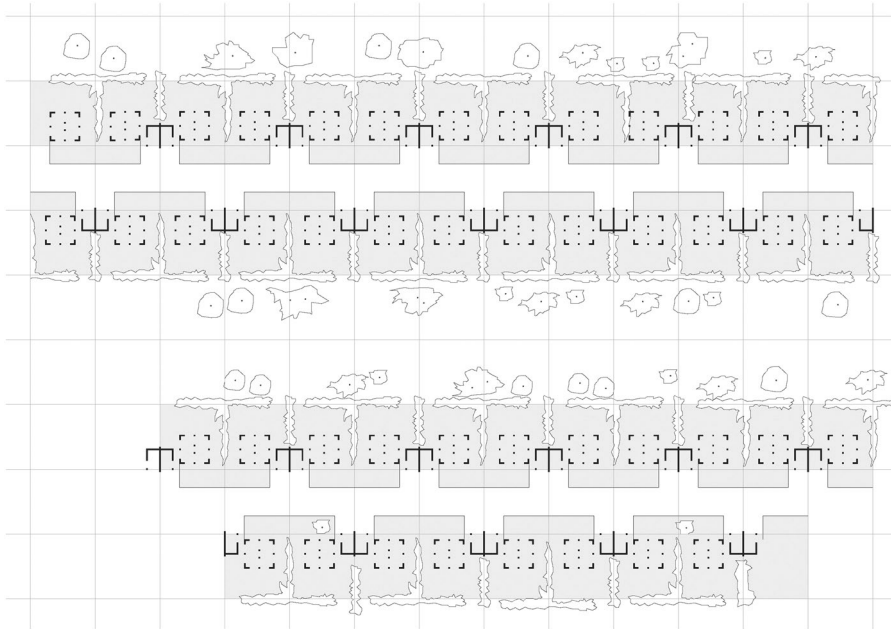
A partial site plan for the Preliminary Proposal “A”. Image: author
